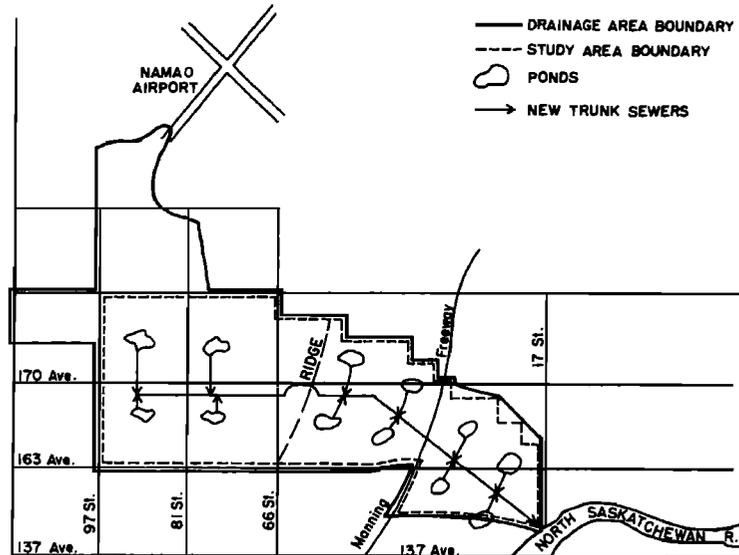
Schematic of alternative 2, pumping over the ridge through a piped system.
